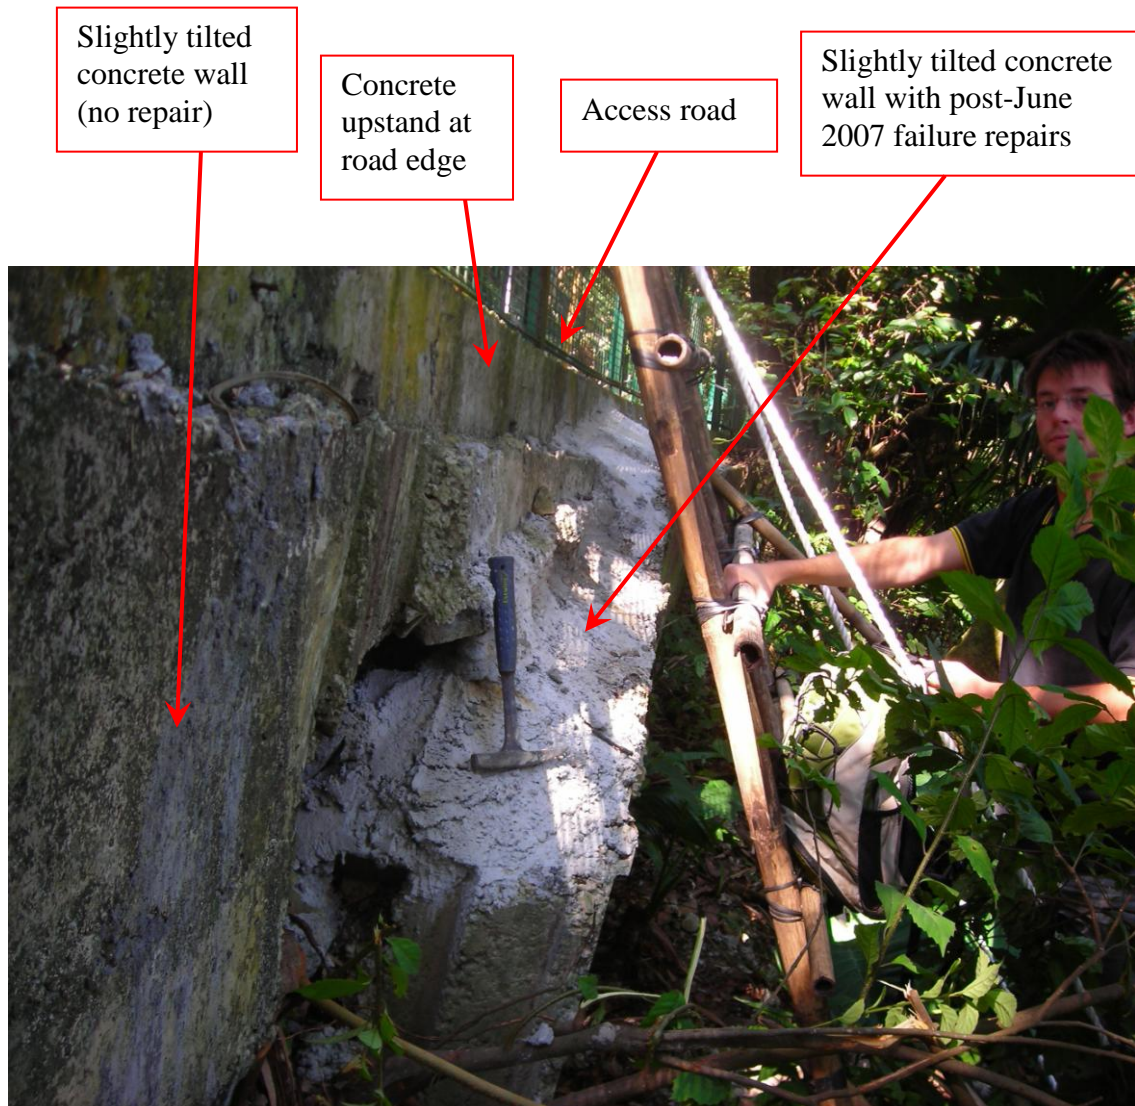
Concrete Wall between the Access Road and Hillside below
